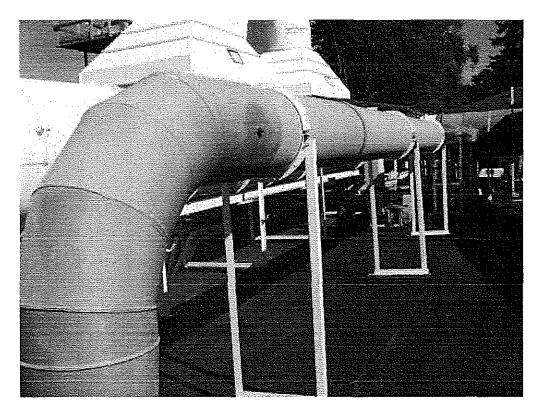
(Photo 2): Looking north, towards scrubbers #3 and 4.
